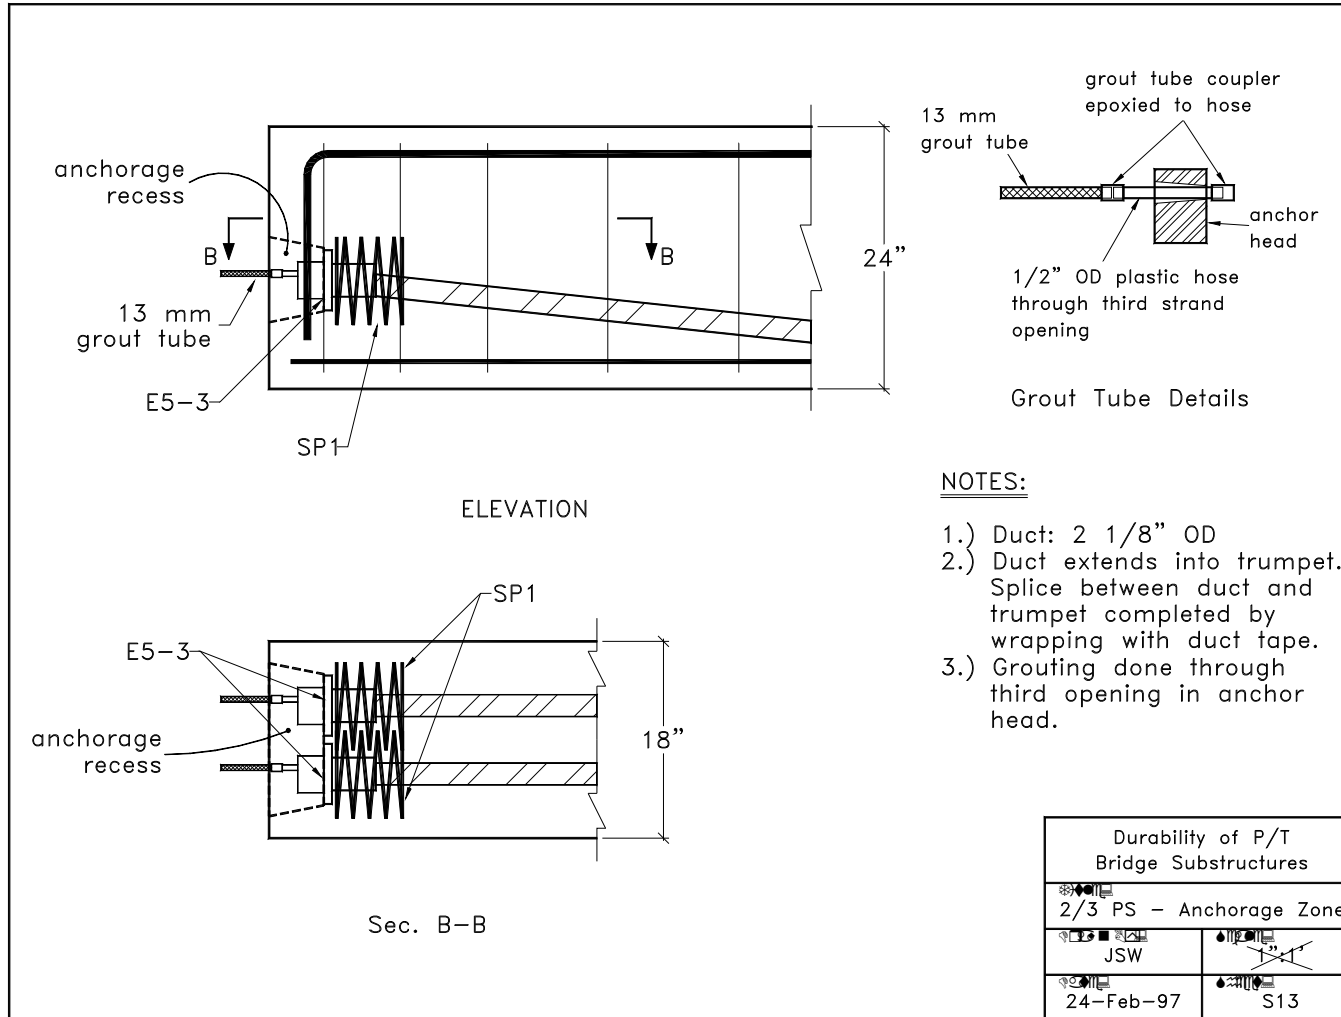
Sheet S13: 2/3 PS Anchorage Zone
